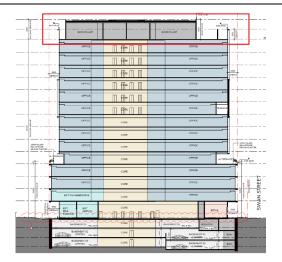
Overall Section – North – South 1 showing the 3 metre high parapet proposed to conceal roof plant along the Swan Street interface and long range surrounding views.
